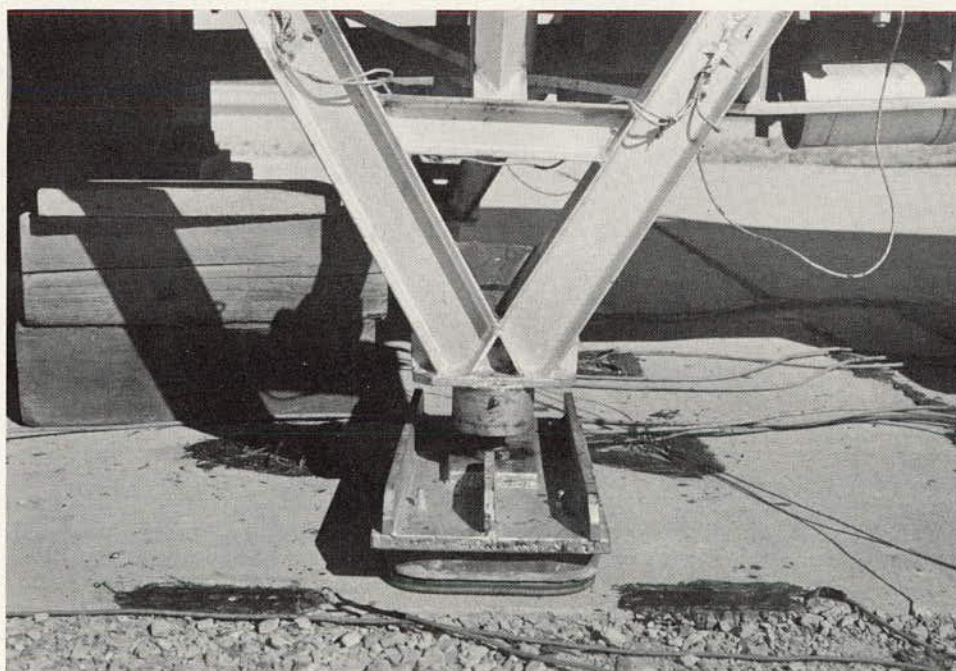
Close-up of strut on vibrating loader, showing location of strain gages that provided continuous record of loading.
